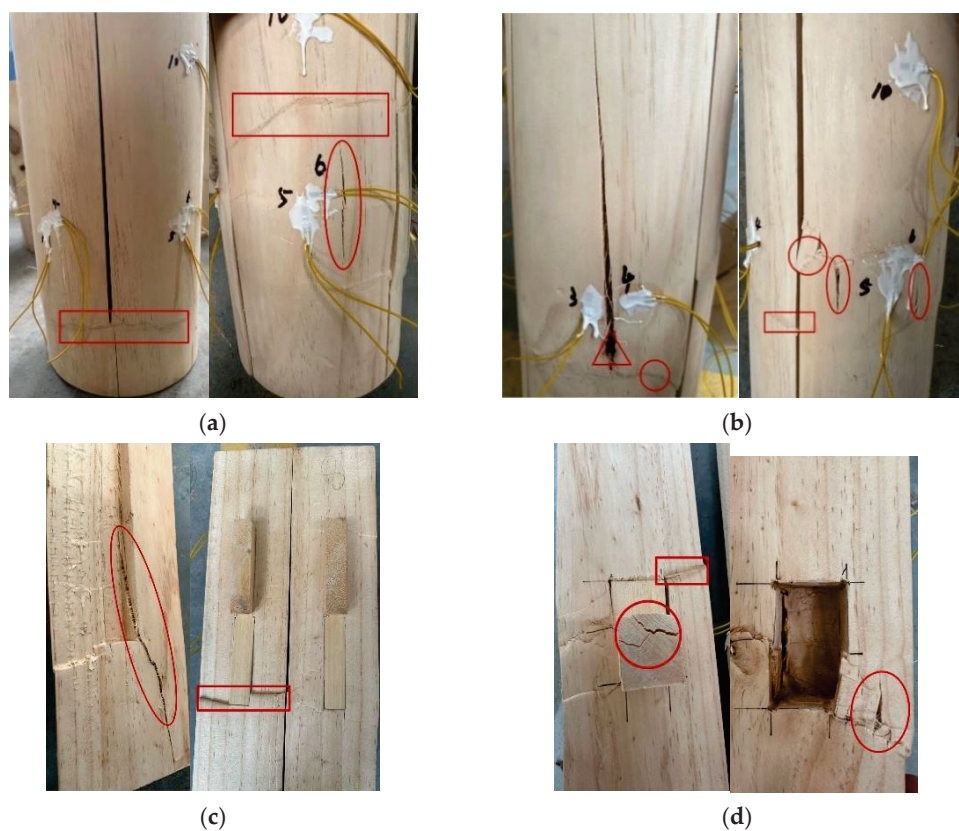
Failure mode of specimens. (a,b) Cracks on the surface of the specimens and (c,d) cracks within the specimens.
